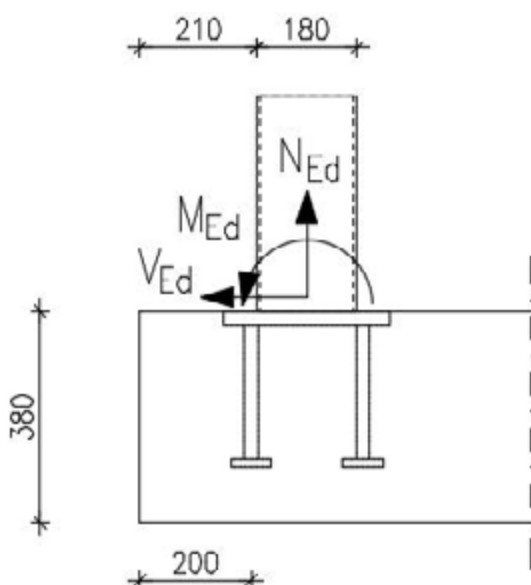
Dimensioning example for JKL fastening plate, fastening plate on a slab
